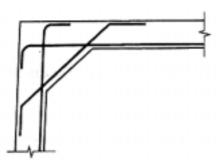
Reinforcement along inner side of corner in haunch or frame structure
